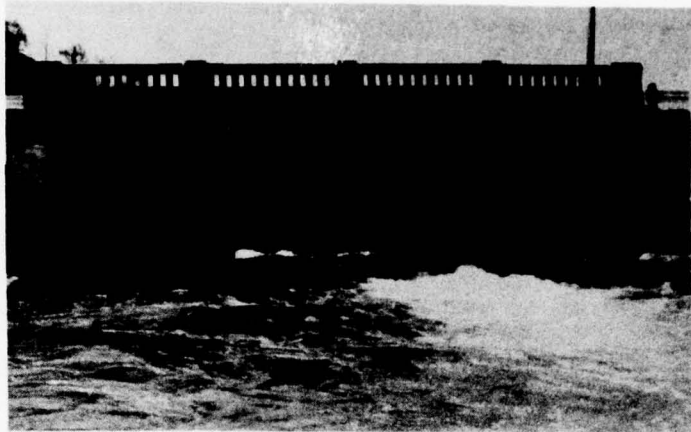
View of the downstream face of the spillway bridge over Matawan Creek; the concrete spillway is in back; the right low level outlet is fully open; discharging water strikes the left bridge abutment before continuing downstream; Matawan Creek is tidal and the picture was taken near high tide
